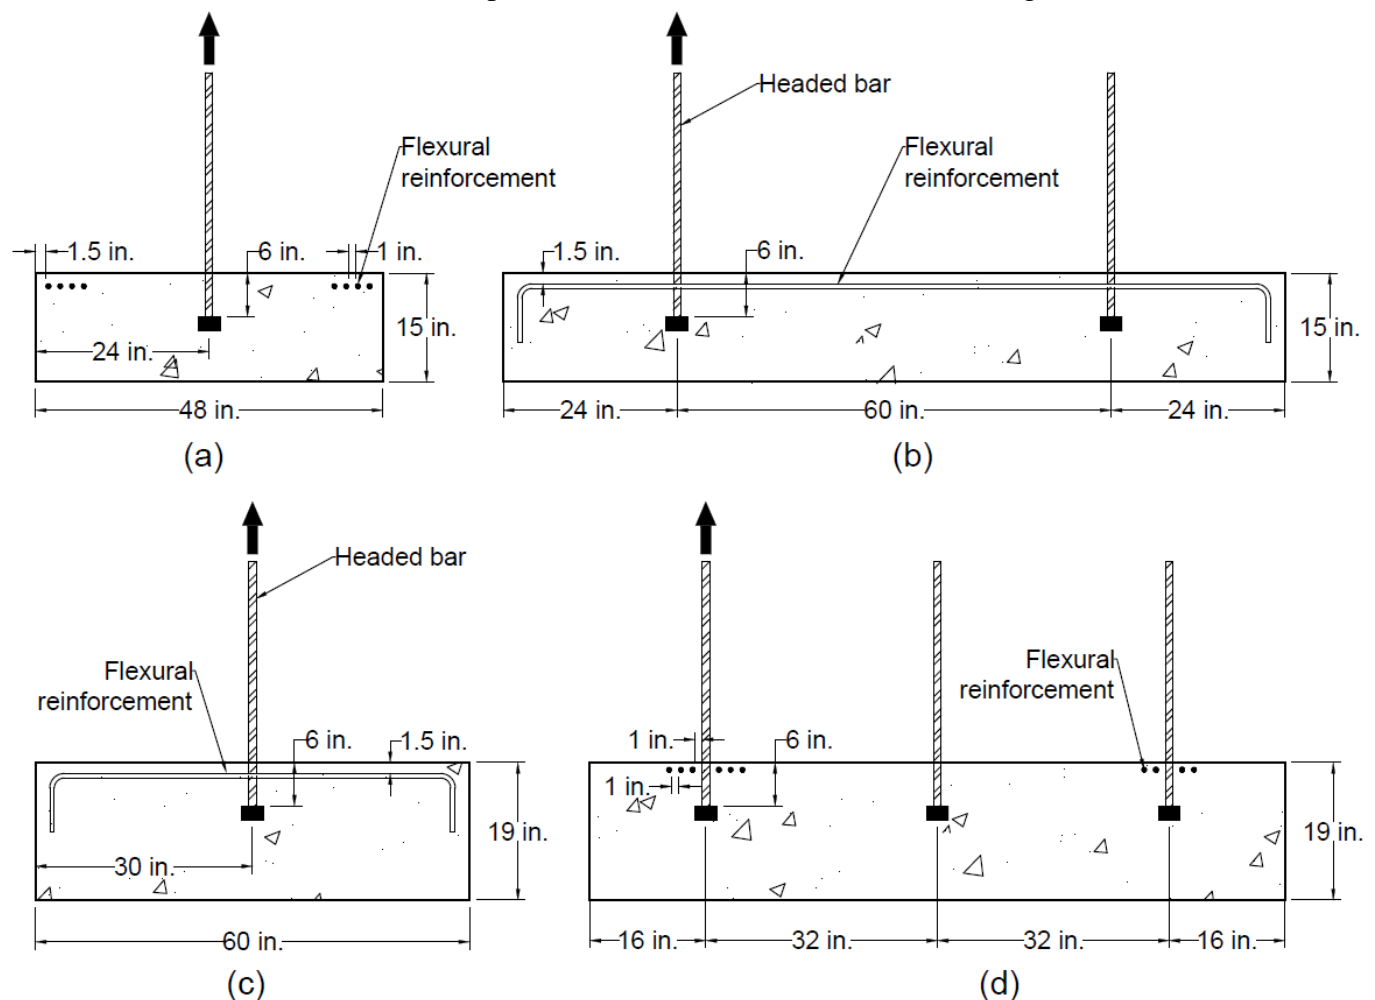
Location of headed bars and flexural reinforcement: (a) front and (b) side views of specimens in first five series, (c) front and (d) side views of specimens in Series 6
